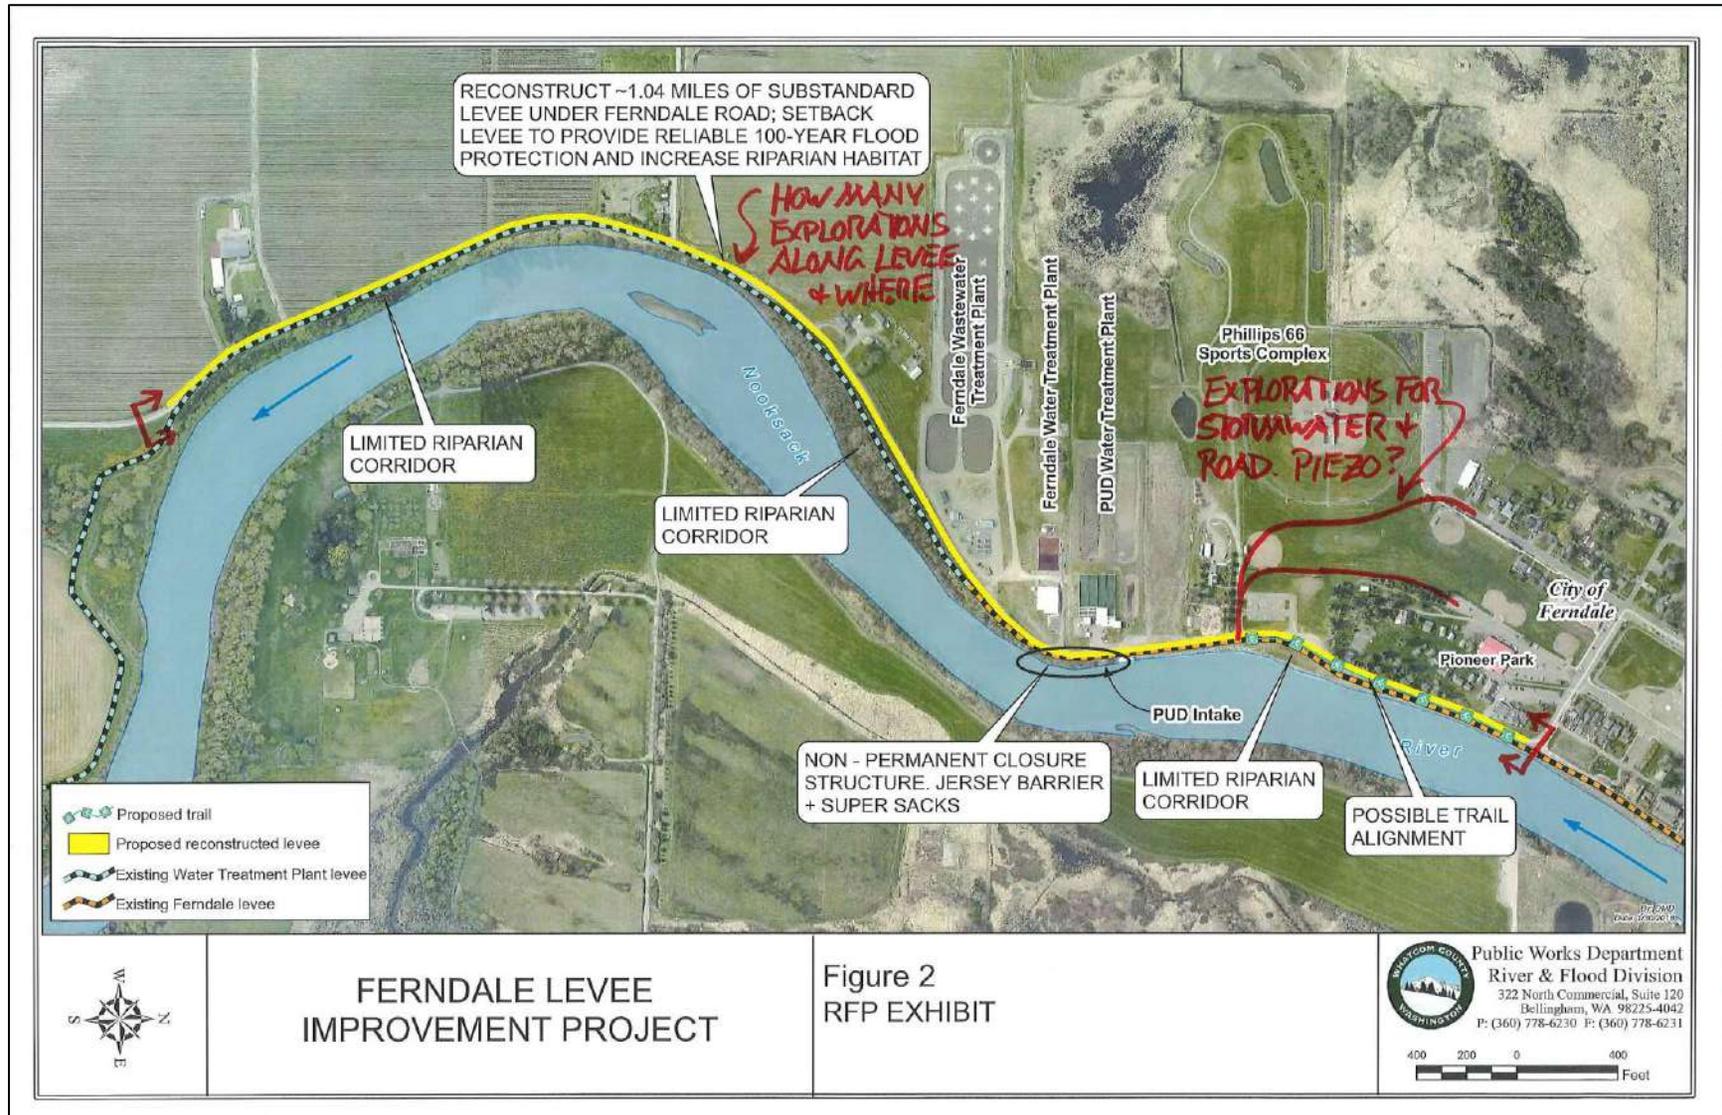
Site plan for the proposed project, courtesy of Reichardt & Ebe Engineering Inc.
